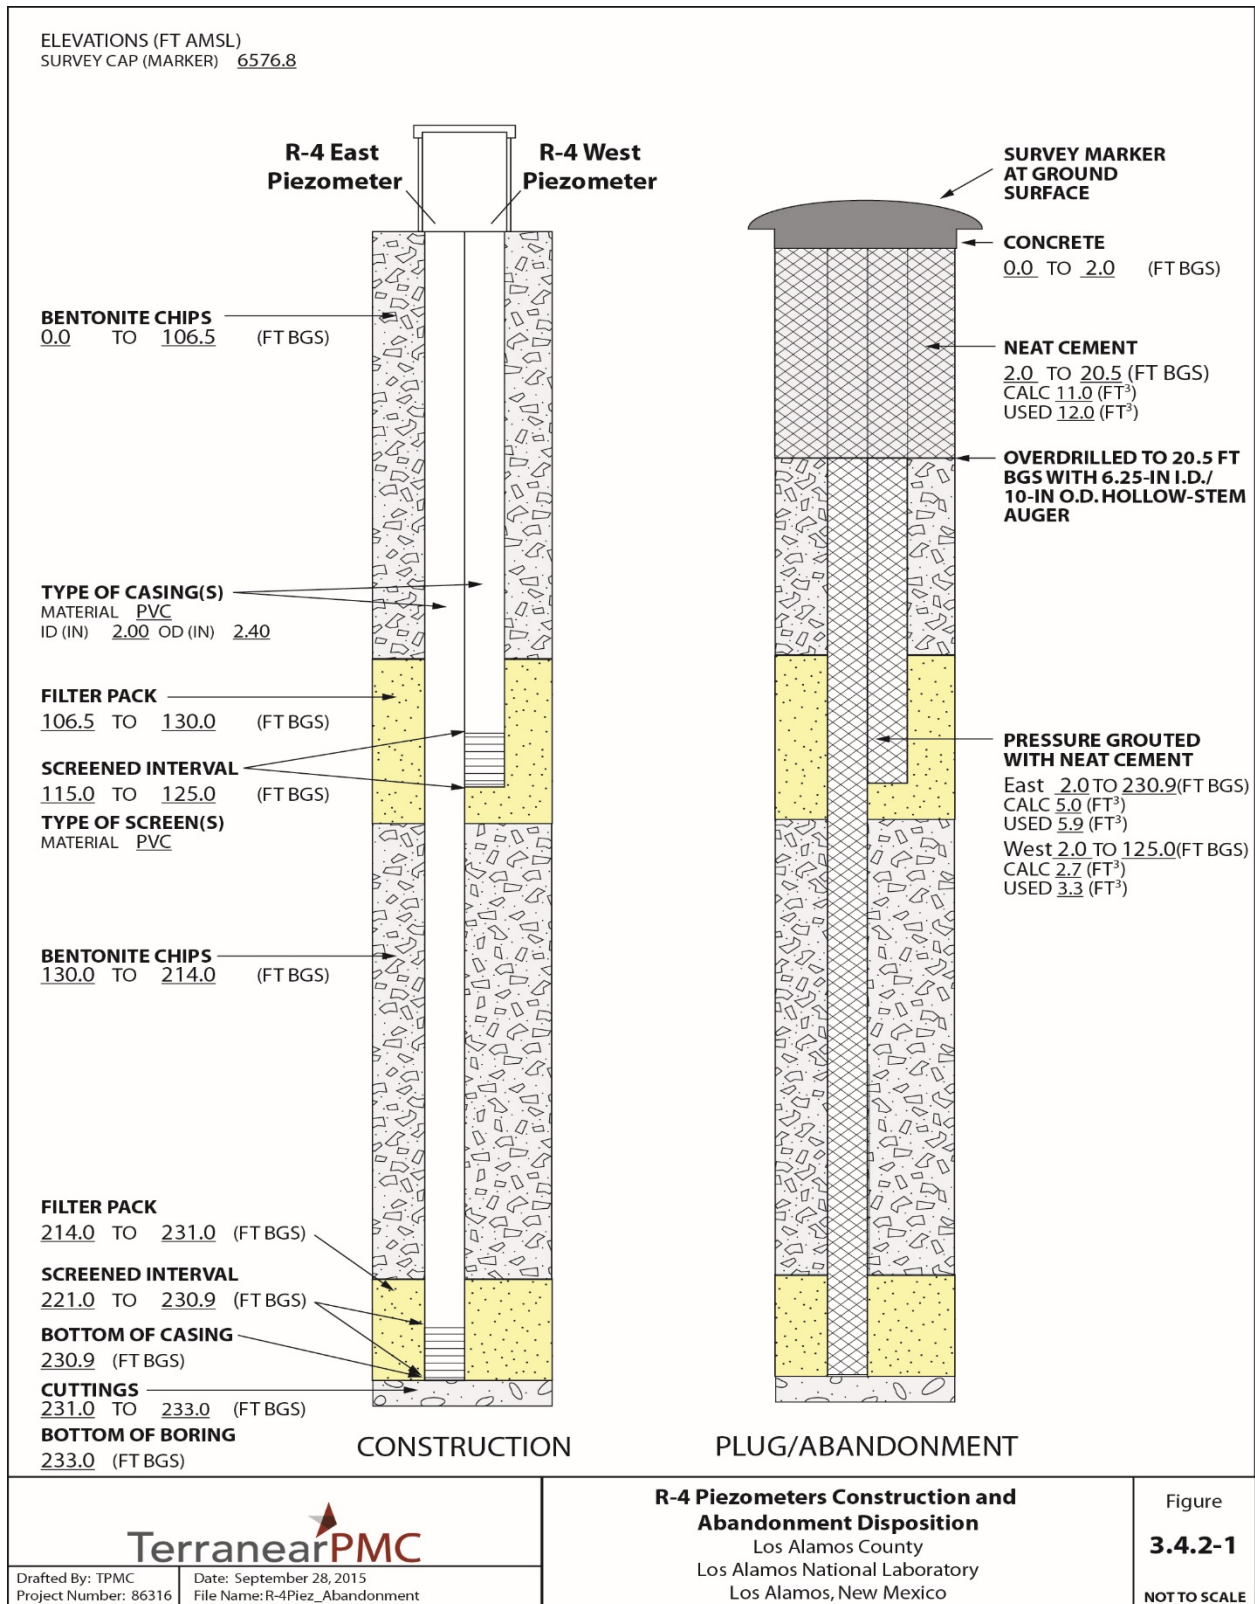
R-4 East and West piezometers construction and abandonment disposition
